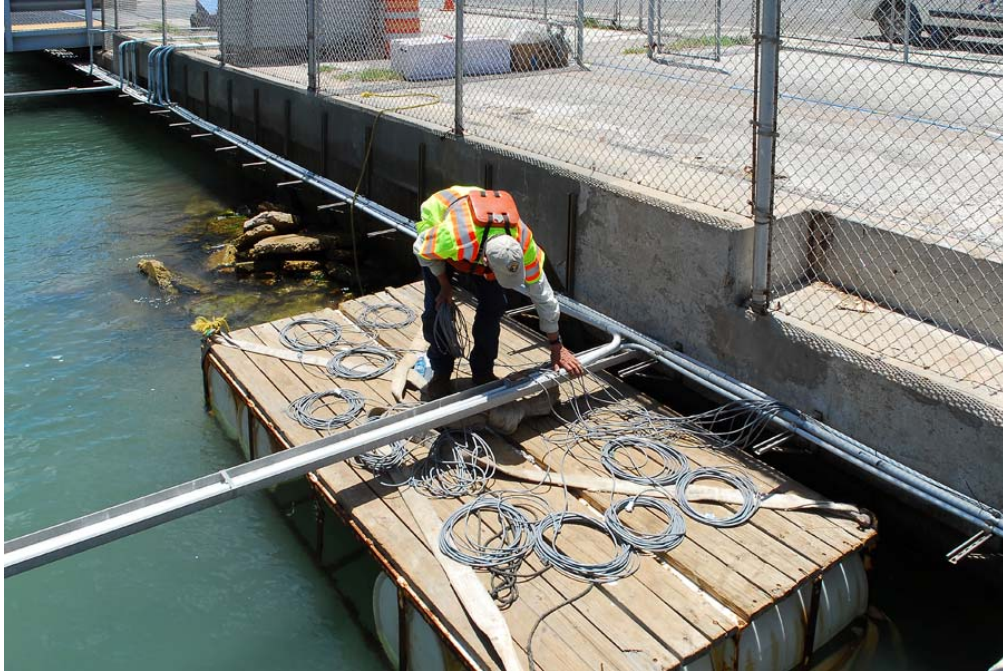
Photograph Showing Cable Being Bundled and Routed from Ramp to Out-Building.
